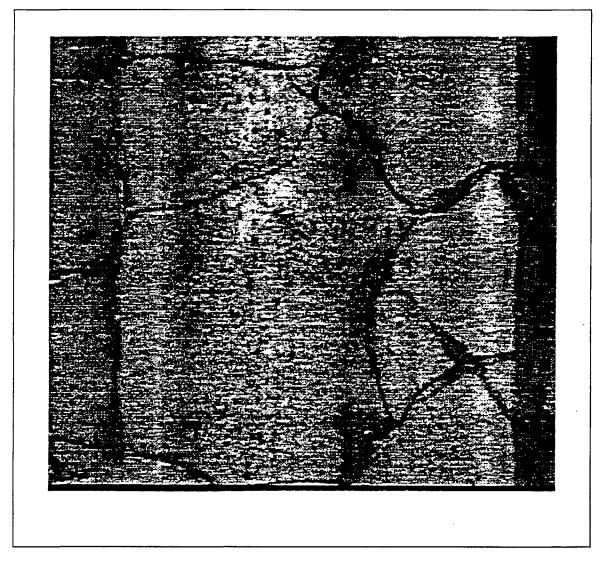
An image of cracked pavement after the application of a contrast enhancing operation. Source: *Video Image Processing for Evaluating Pavement Surface Distress
